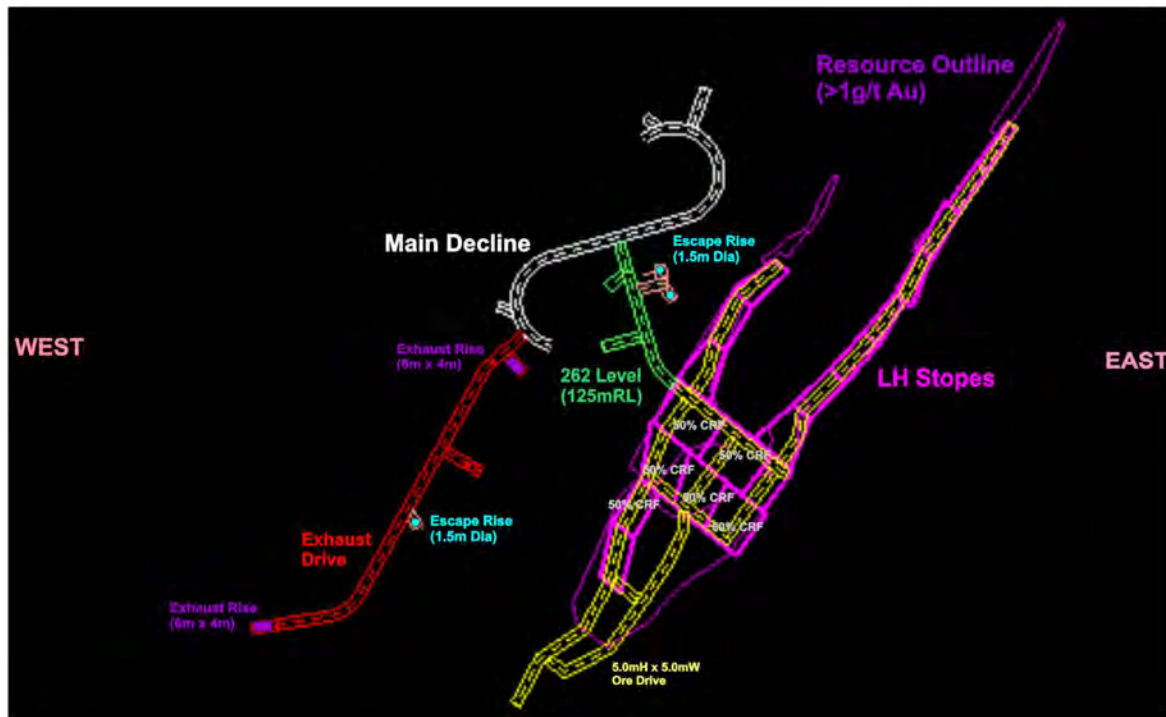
Underground Mine 125mRL Stopping Layout
